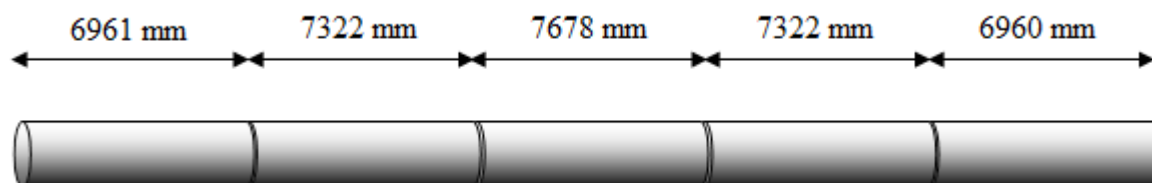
Schematic assembly of pipe segments for specimen of Test No. 7.
